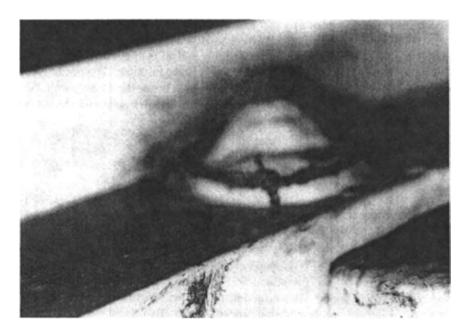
[S41] "Grease" deposits at the head of the bearing-bolt of Figure 4-31, indicating a loose bolt.
